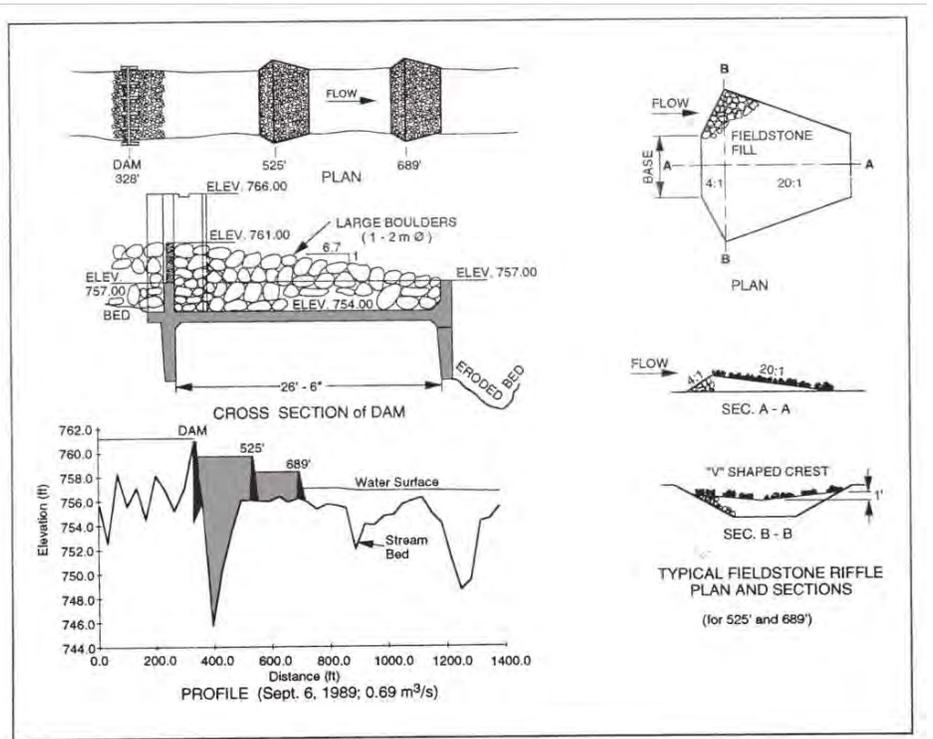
Roseau River dam back-flooding construction details (Gaboury et al. 1995).
